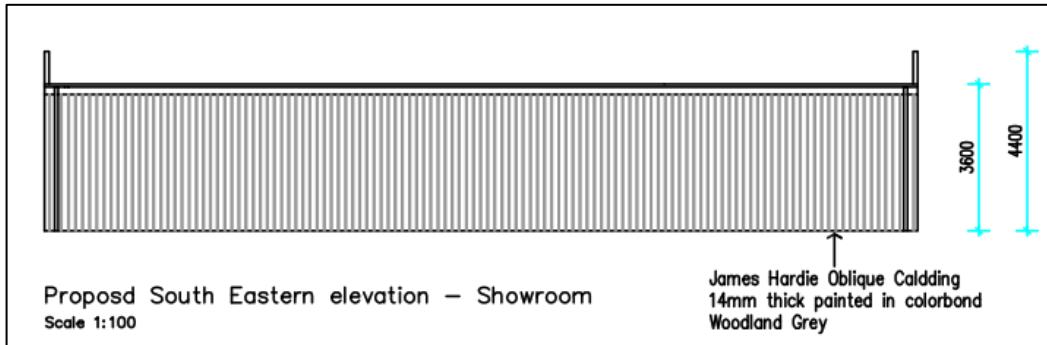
South-eastern elevation of sales building (Source: Badaoui Group, 2025)
